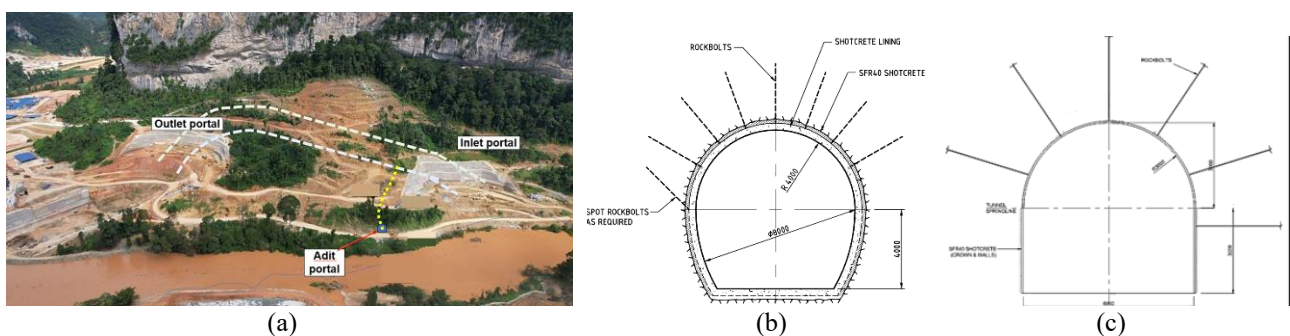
(a) Site layout plan (b) Typical section DT (c) Typical section of TCA
